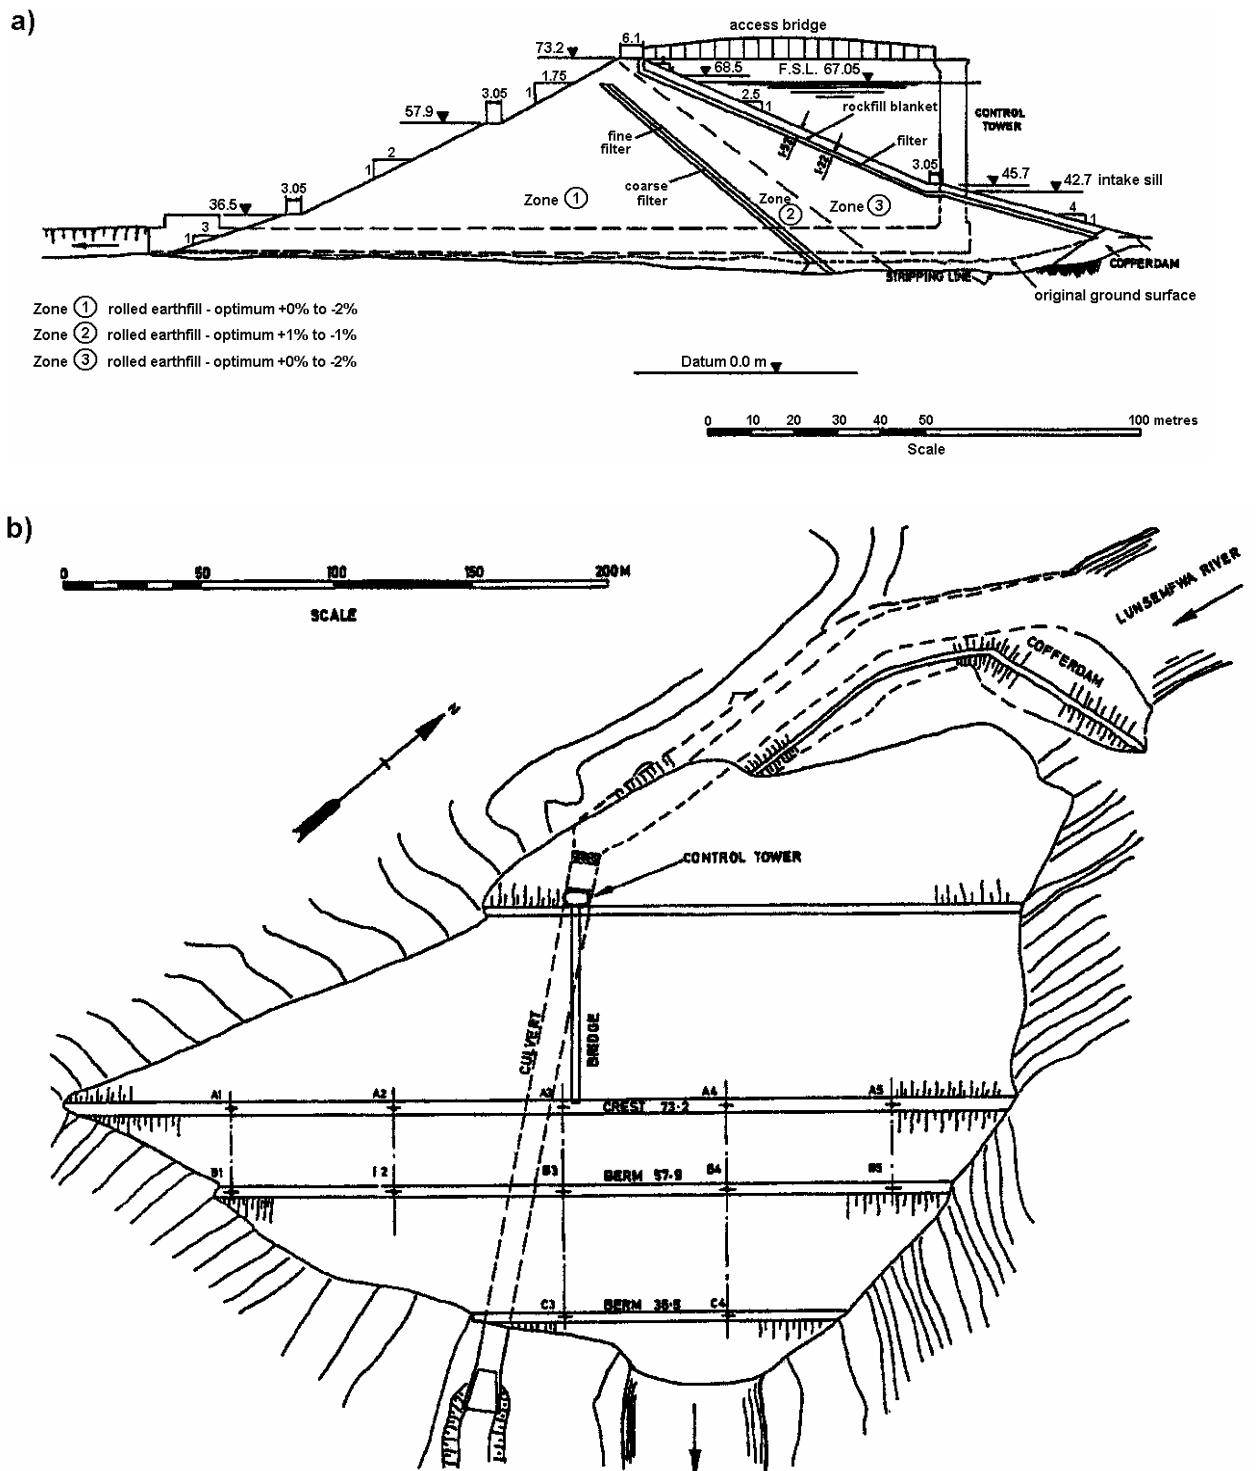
Mita Hills dam, (a) cross section, and (b) plan showing SMP locations (Legge 1970).
